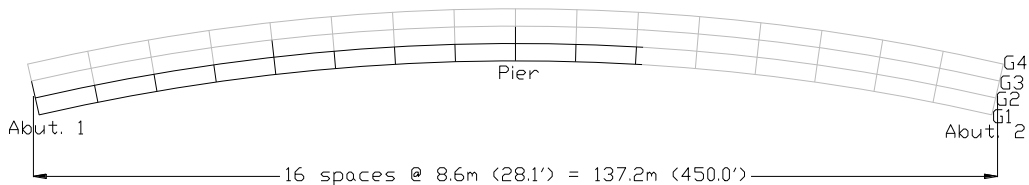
Stage 1 of Construction for Paired Girder (Inner Girders Placed First) Erection of Two Equal Span, 4-Girder, 305-m (1000-ft) Radius Bridge.
